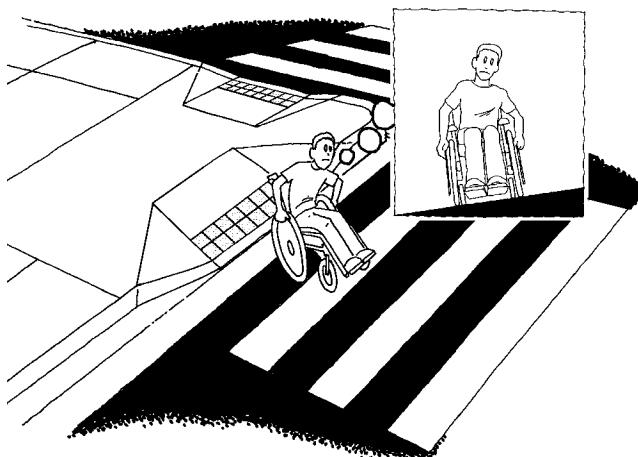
If intersections are not level, the slope of the roadway translates into a difficult cross slope for wheelchair users to travel across.
